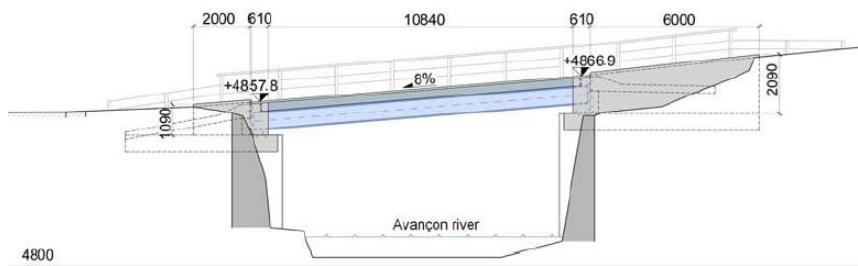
Longitudinal section (mm) (Keller, et al., 2014)
